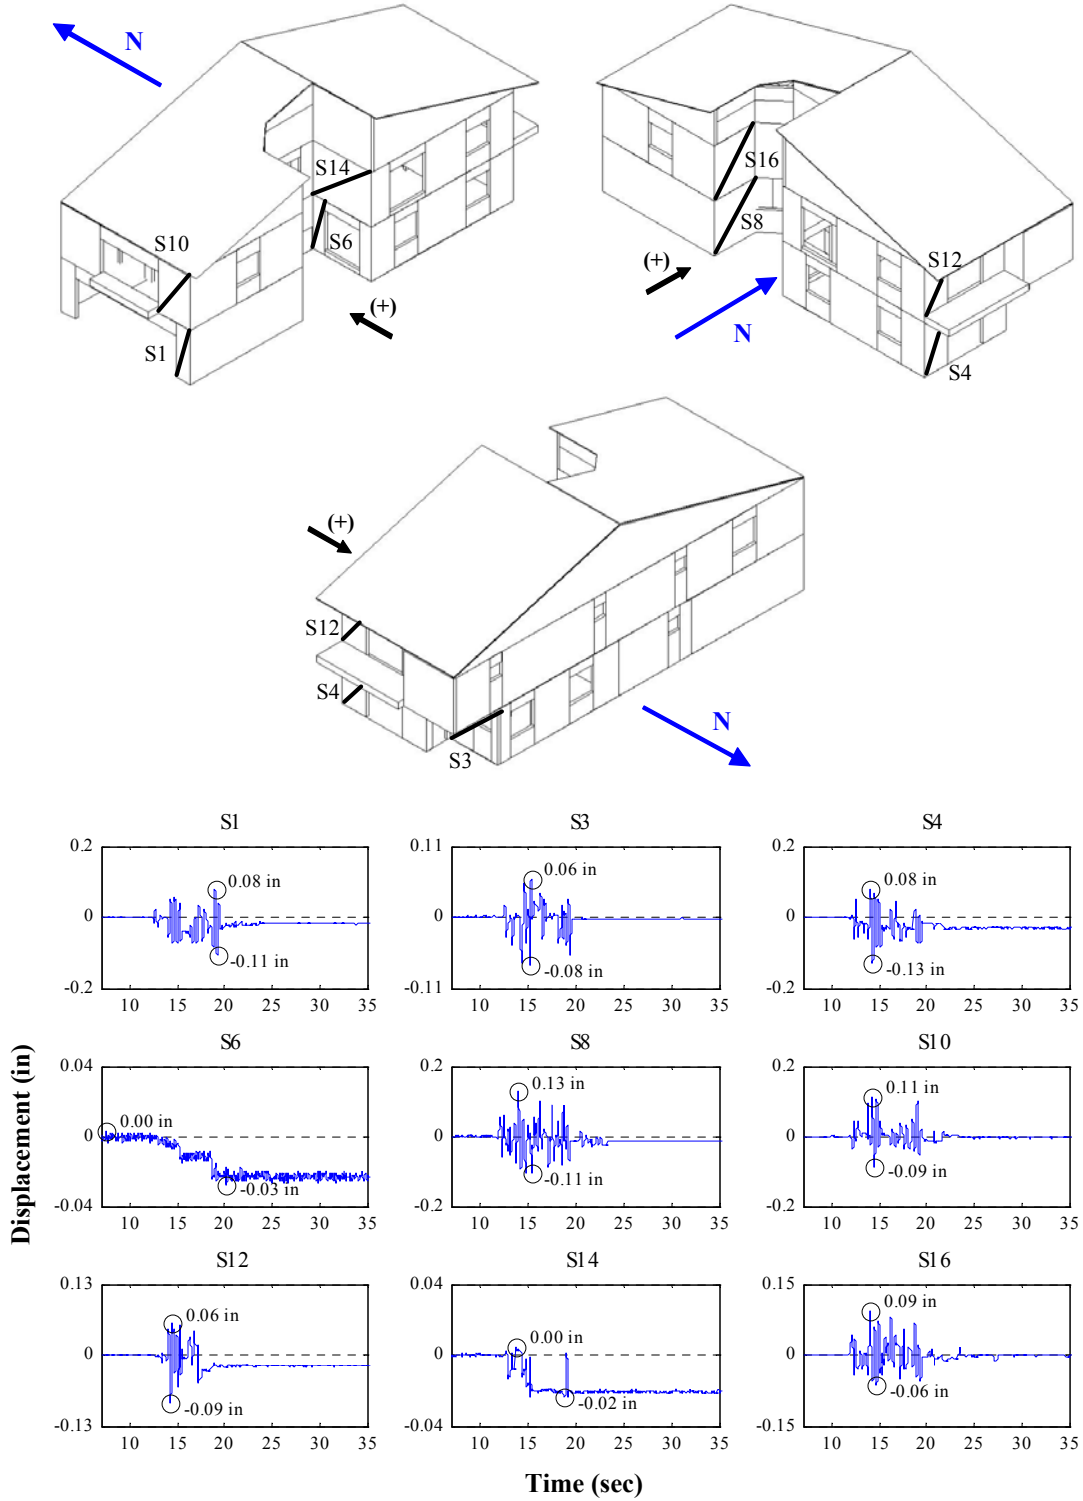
Wall deformations of north-south external walls for Test NWP2S13
